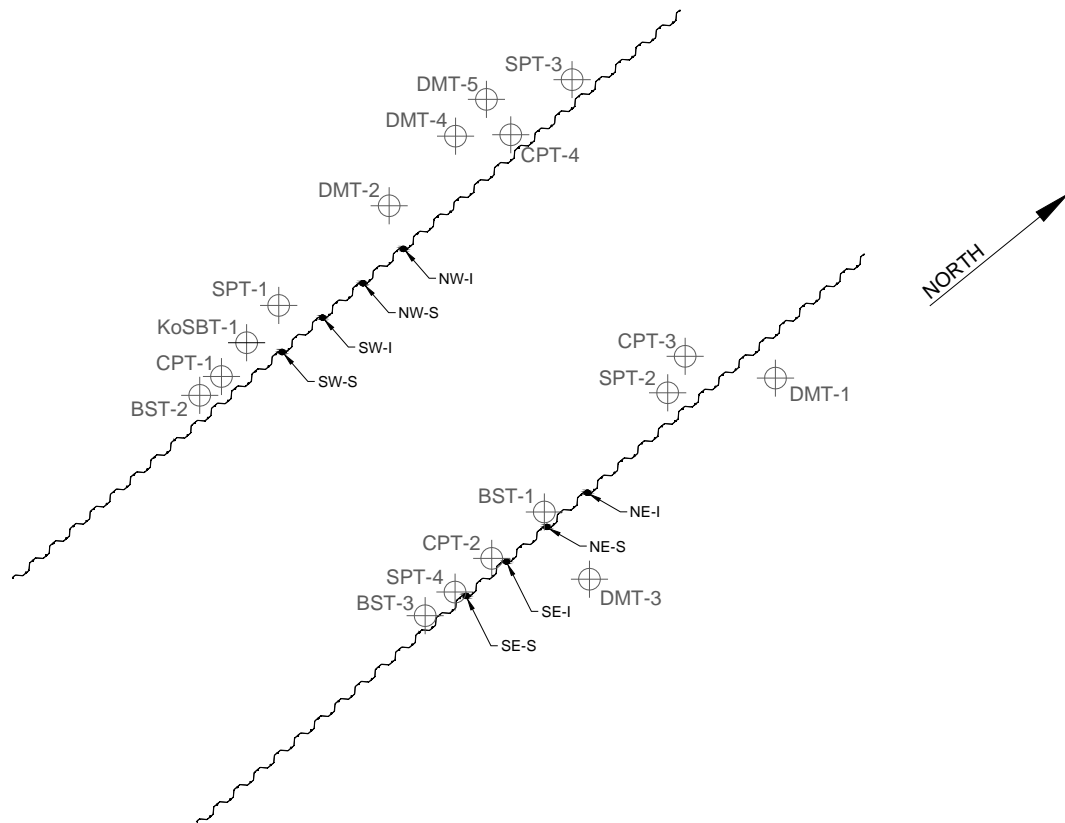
Location of in-situ soil tests with respect to wall placement
